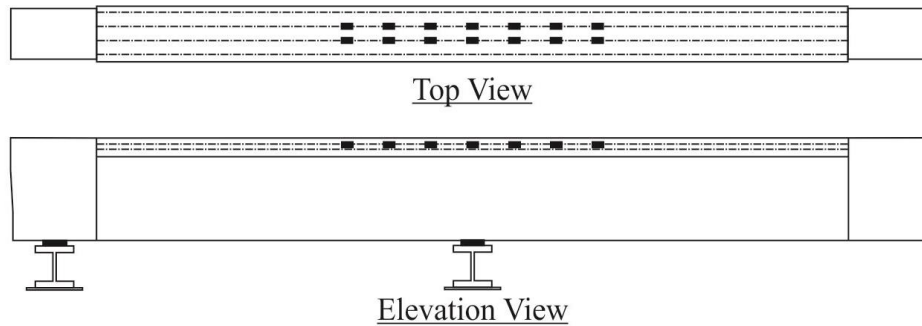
Location of 5-mm foil strain gages: NB precast specimens
